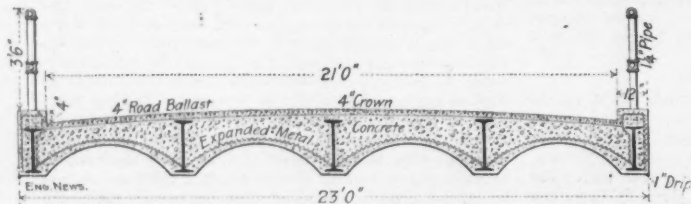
CROSS-SECTION OF HIGHWAY BRIDGE OF CONCRETE AND STEEL I-BEAMS, EVERGREEN ROAD, PITTSBURG, PA.
